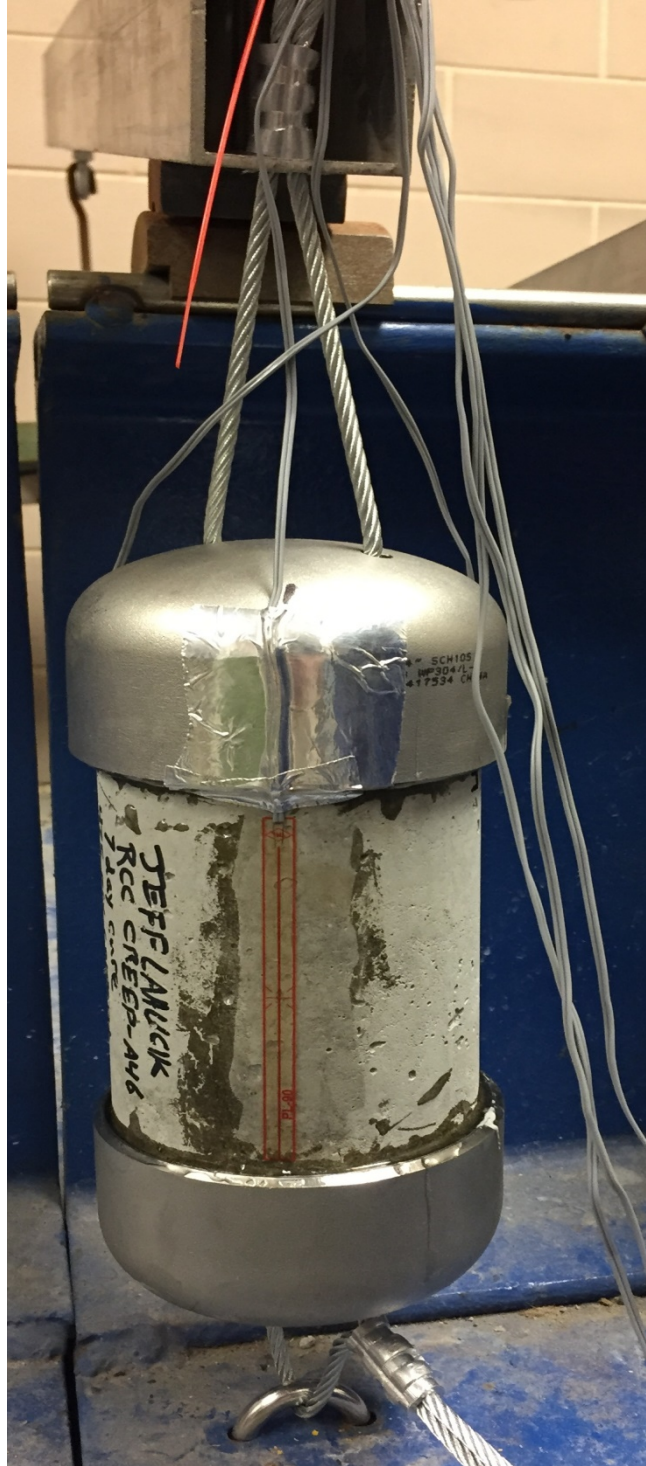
Tensile Creep Specimen Loaded in Cantilevered Dead Load Frame.
